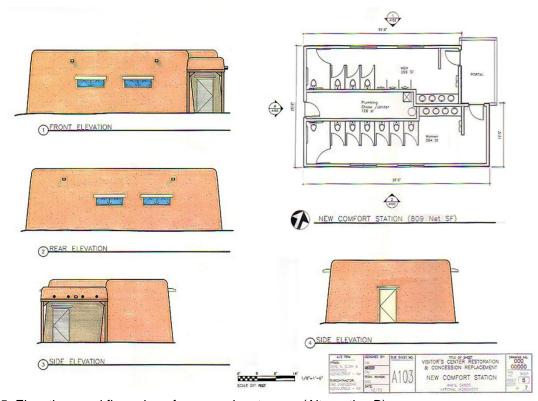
Elevations and floor plan of proposed restrooms (Alternative B).
